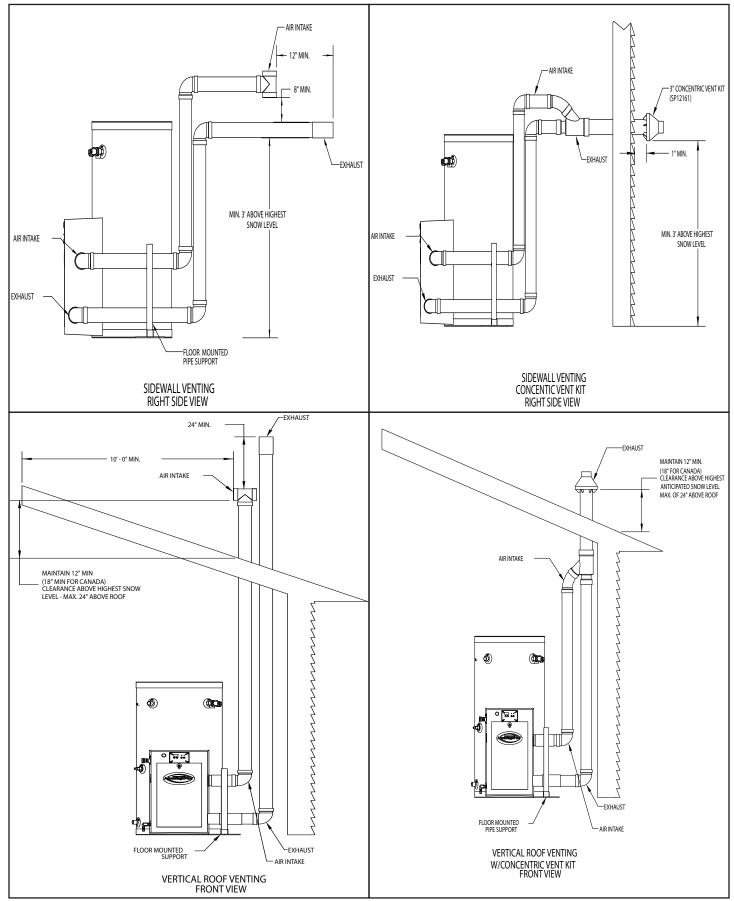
Venting Detail – NOTE: This drawing is meant to demonstrate system venting only. The installer is responsible for all equipment and detailing required by local codes.
